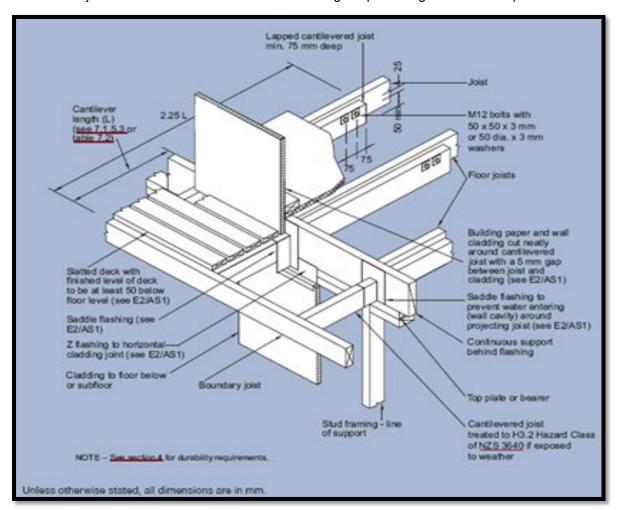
NZS3604:2011 detail for lapped cantilevered joist installation
